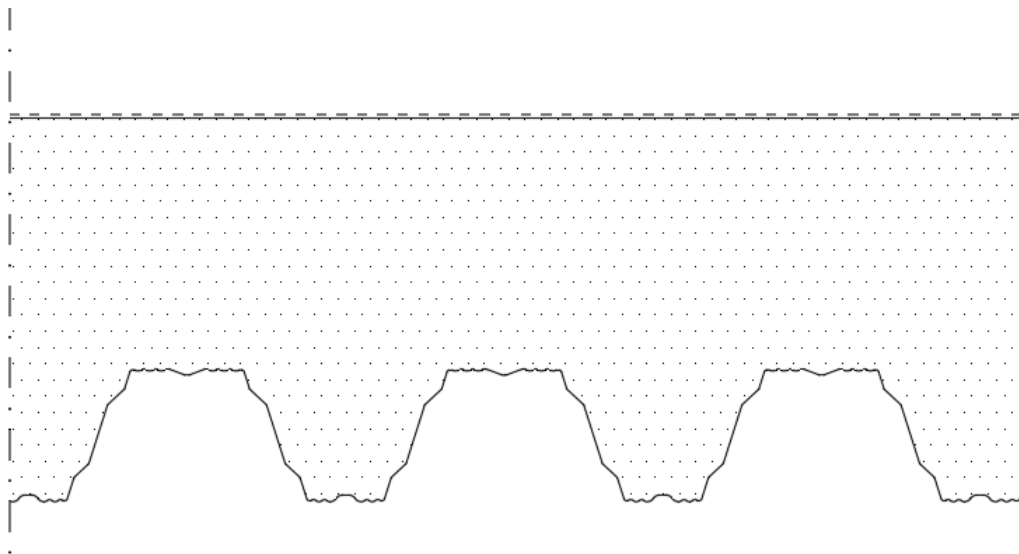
Prefabricated roof element (retell Kesti 2018d).
